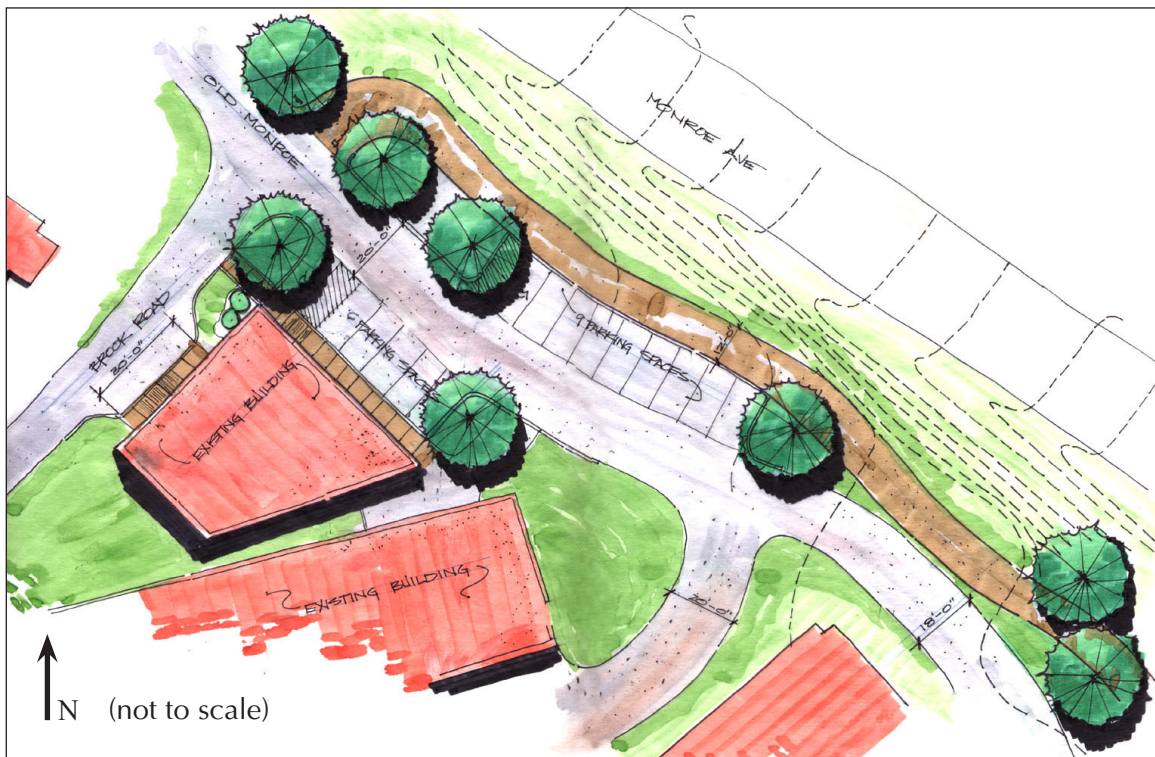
Old Monroe Avenue/Brook Road Intersection Reconfiguration
